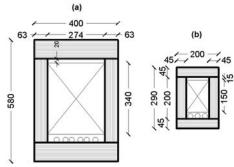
LVL sections – (a) Simply supported beam (b) Statically indeterminate beam
